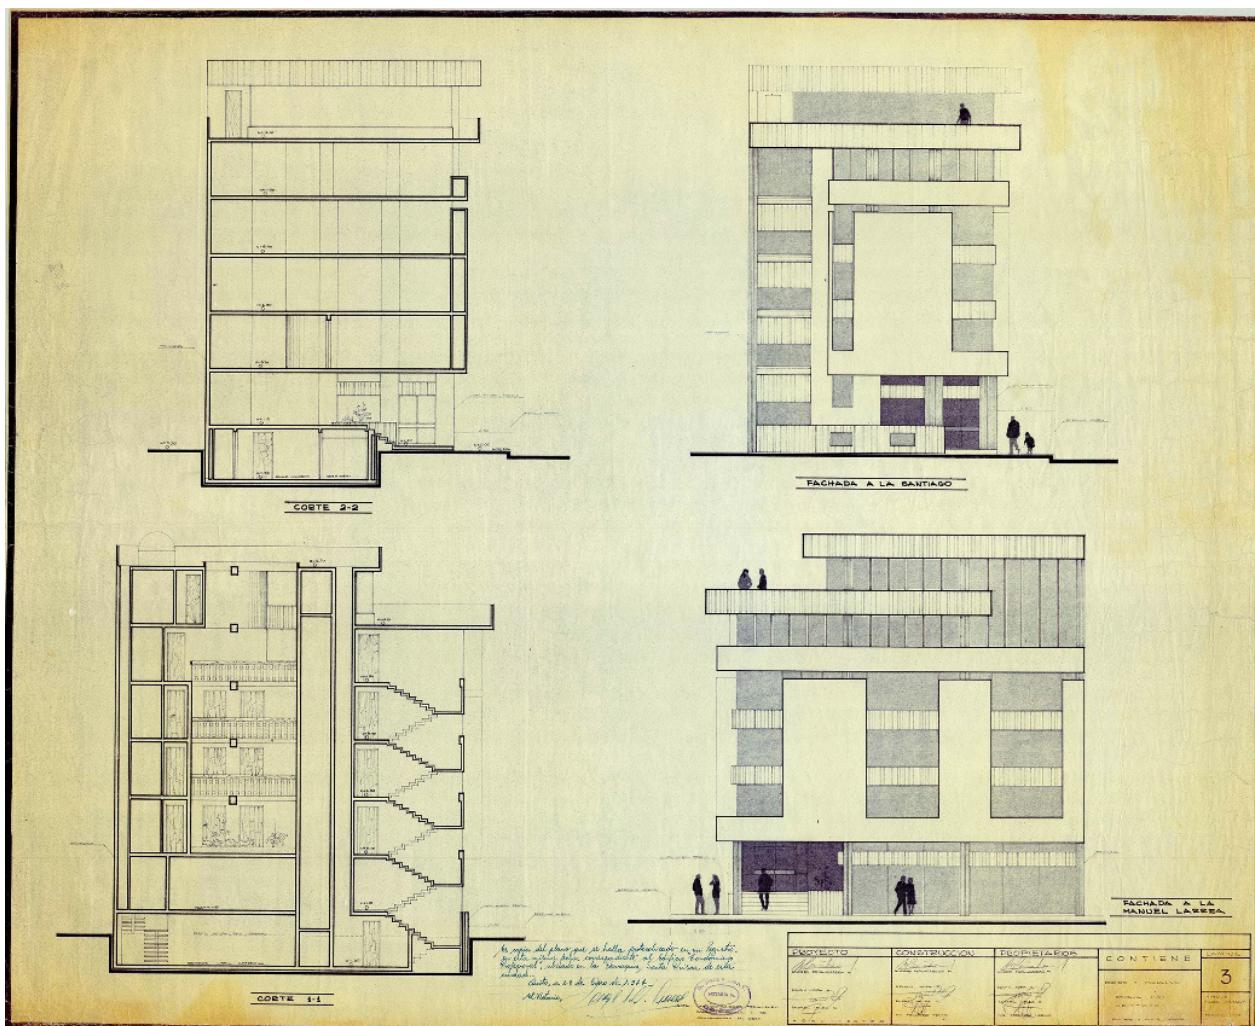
Plan N°3 of the Condominio Profesional building. Original notarised plan, sections 1 and 2 and elevations a la Santiago and Larrea, Esc. 1/50. (Source: Archive Andrés Peñaherrera Mateus).
